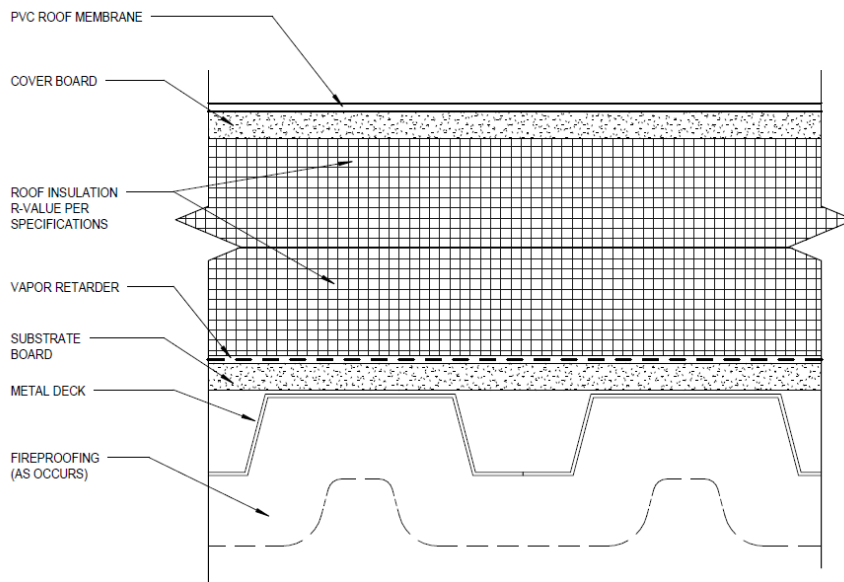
| Penthouse Roof Section (SmithGroupJJR)
